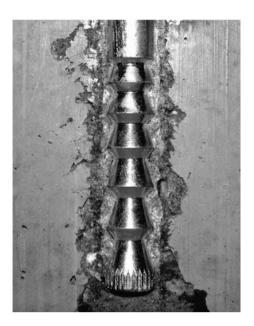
Anchoring detail composite spread anchor MKT-VMZ M16
